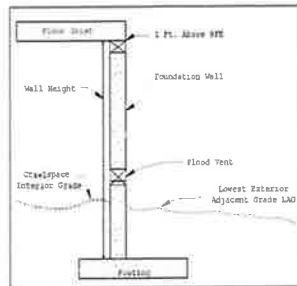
BELOW-GRADE CRAWLSPACE CONSTRUCTION
